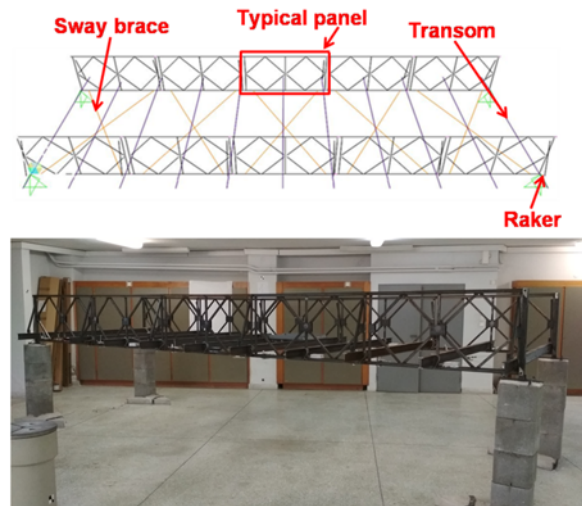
Bailey bridge FEM (up) and constructed model (down).
